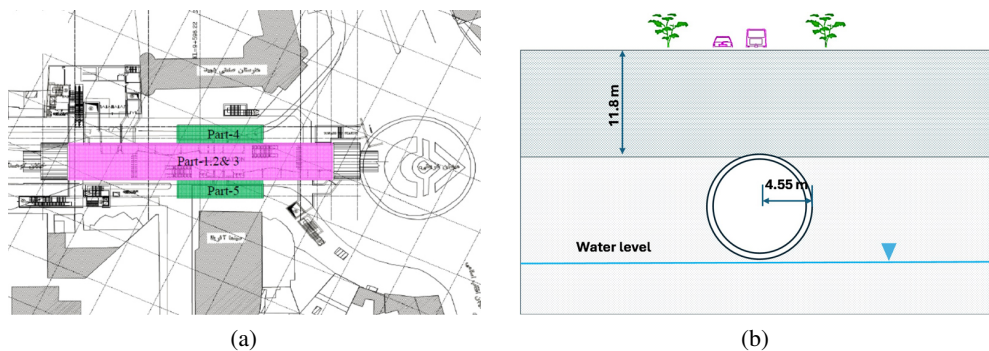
(a) Plan, and (b) schematic of the cross-sectional view of tunnel around the I2 Station
